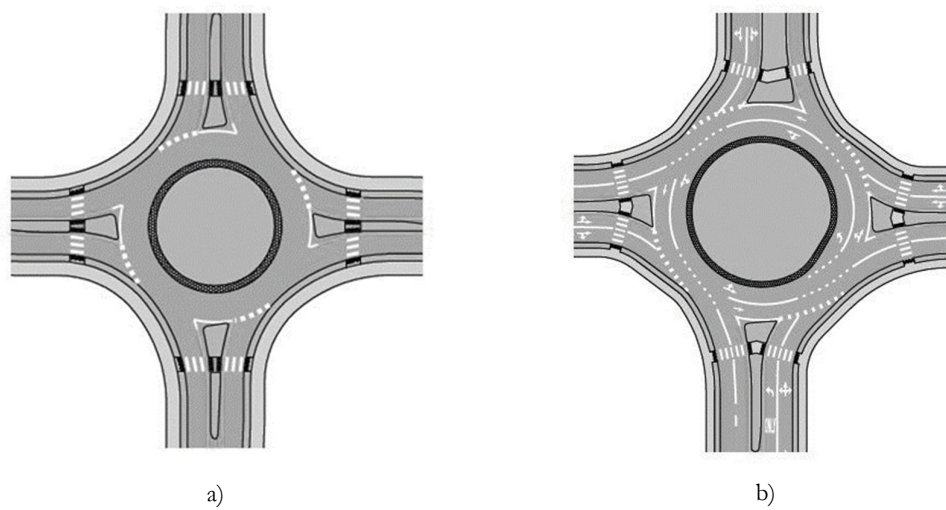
Roundabout layouts: a) single-lane layout; b) multi-lane layout
